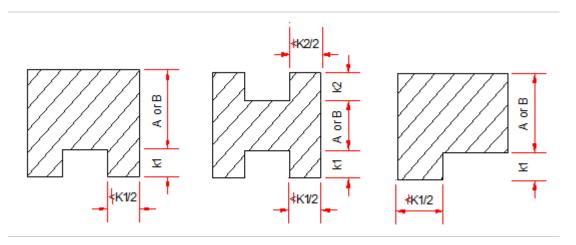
RESTRICTION ON PLAN PROJECTION
